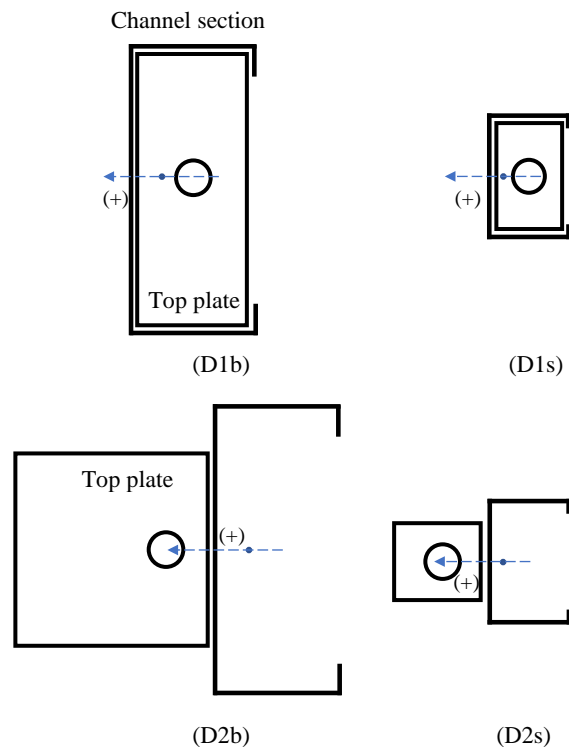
Bracket-stud section for design D1 and D2 and two stud-bracket connections “b” and “s”.
